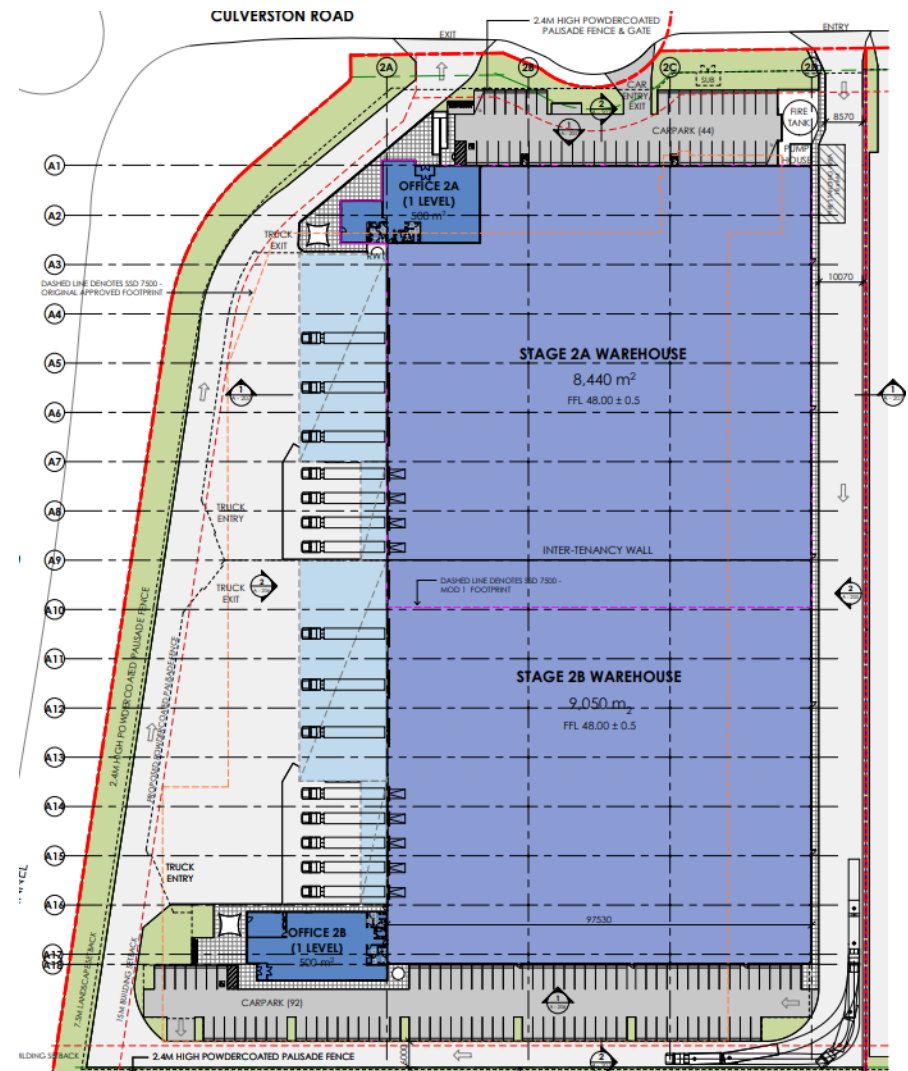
| Stage 2 Warehouse Site Plan, Proposed
